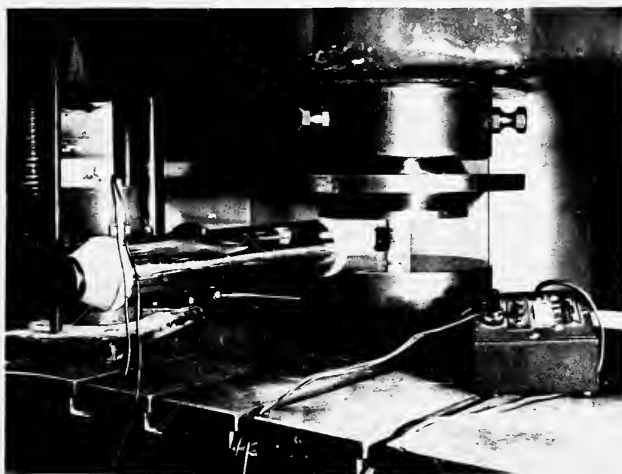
A CORE WITH A TUCKERMAN GAGE MOUNTED ON IT SET UP FOR TESTING
